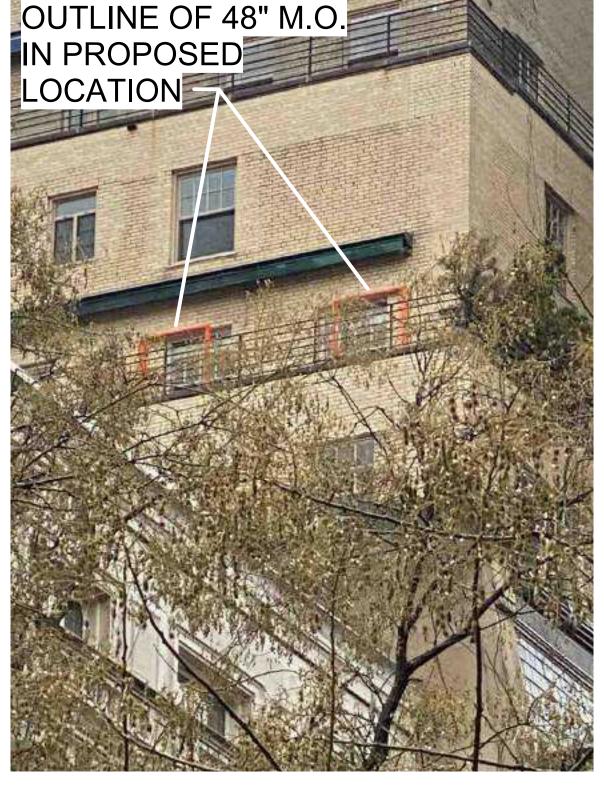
PHOTO CLOSE UP RED FRAMES - LOOKING NORTH NOTE: RED FRAMES REPRESENT OUTLINE OF NEW TERRACE DOORS
